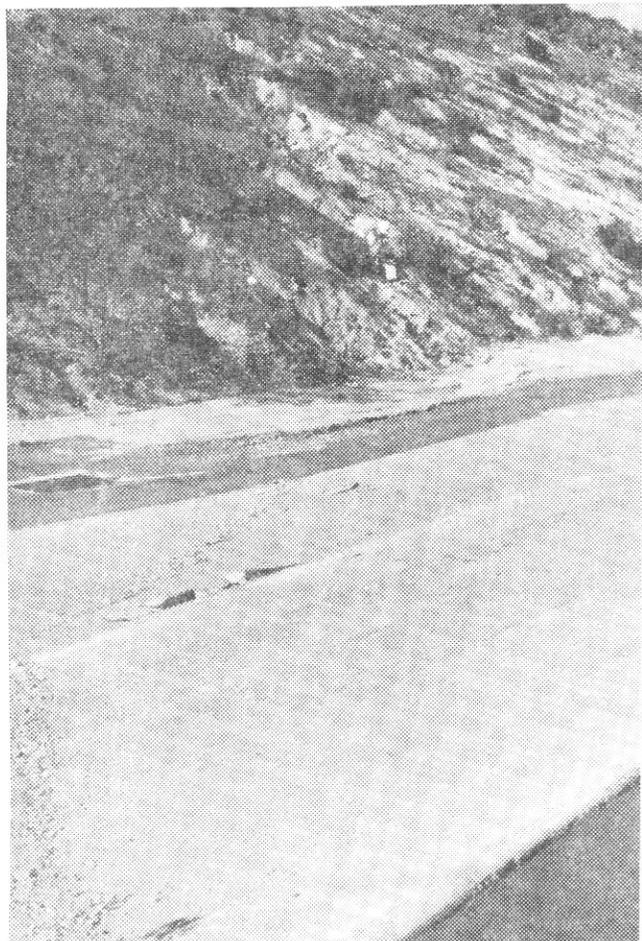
Looking westerly across truck lane pavement. Fault trace extended up cut slope in background.
